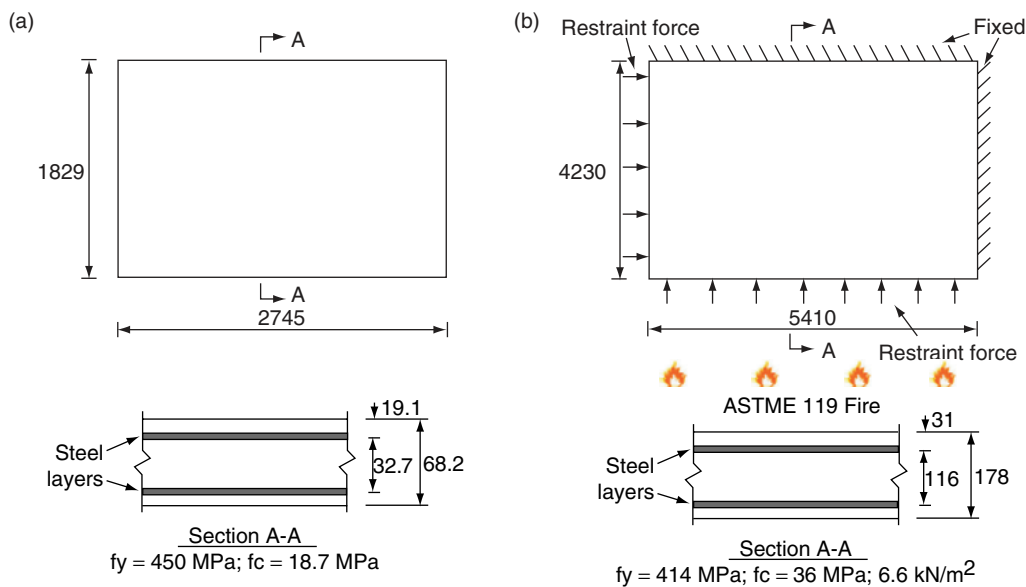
Details of test specimens modeled in OpenSees: (a) specimen B1; (b) specimen S-56
